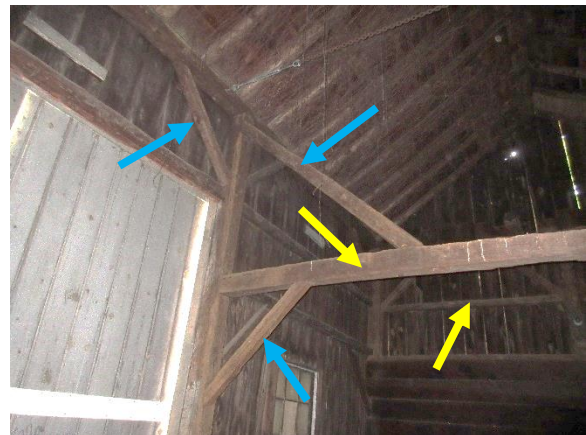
Interior view of tie beams (yellow arrows) and braces (blue arrows) at eastern half of barn.
